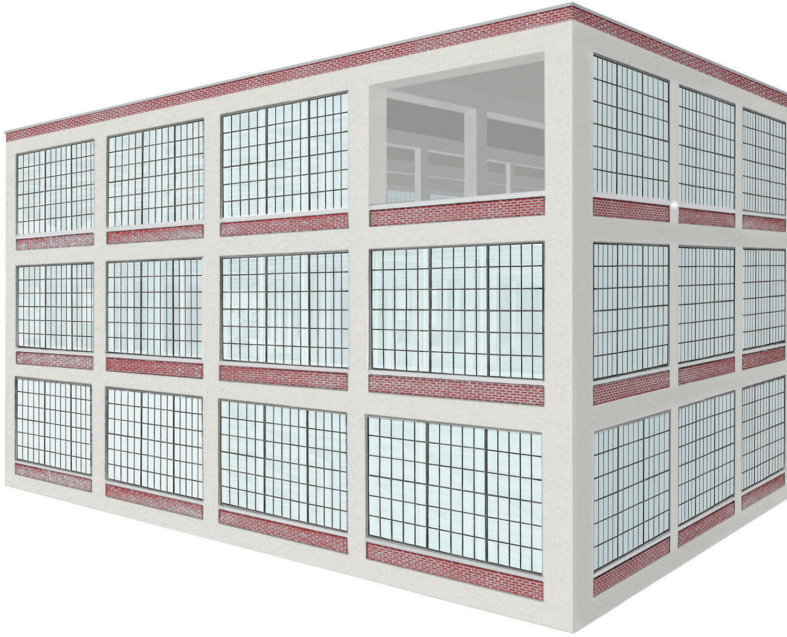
A typical reinforced concrete building from the early twentieth century: the structure is supported by its concrete frame, the floors (and ceilings) are concrete, and nearly the entire space between frame members is filled with windows. The extensive windowed area permitted plenty of natural light to enter the work area. (Effective industrial lighting did not come into use until the late 1930s.)
